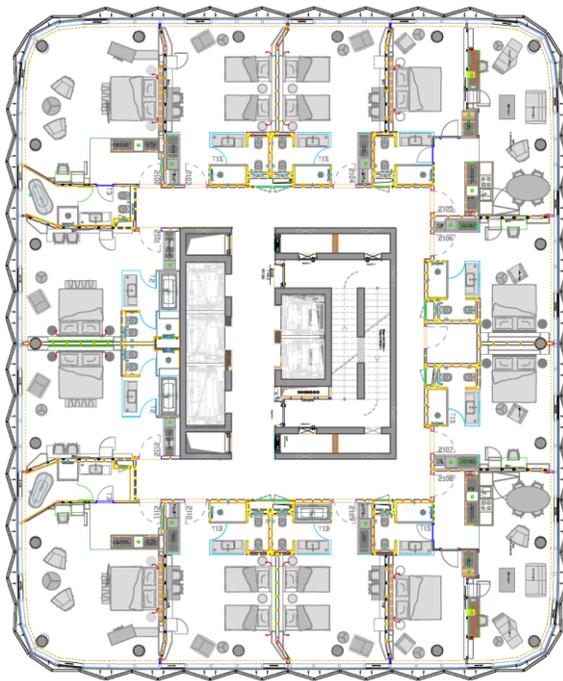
Guestroom floor layout typical floor plan (Floors 14-21)
